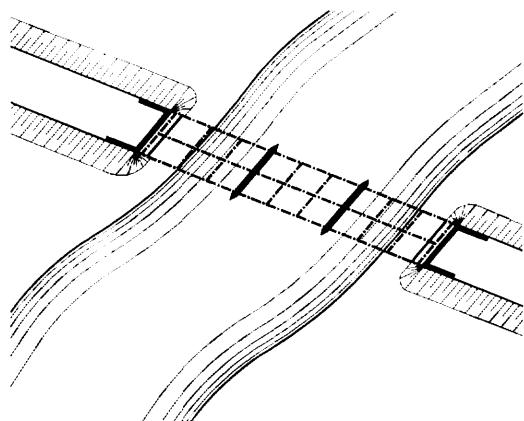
Skew bridge over a river, piers and abutments parallel to river direction [9]
